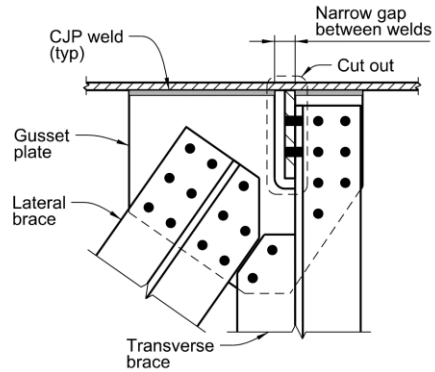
Plan view of Hoan Bridge bracing node connection detail, fracture initiation site.
